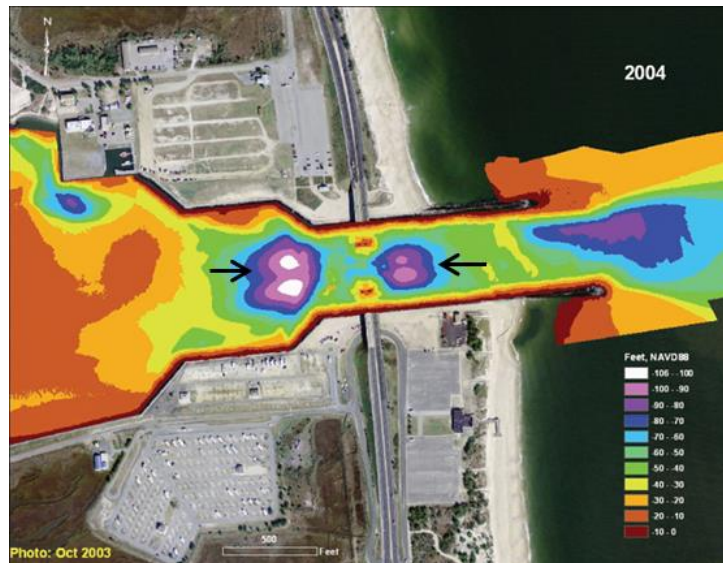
Bathymetry Contour Plot Showing Scour Pits near the Piers of the Steel Girder Bridge.
